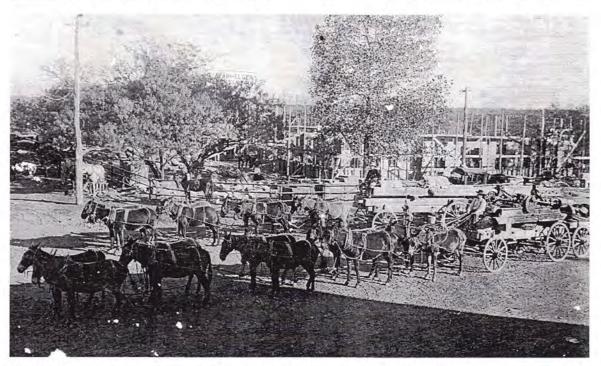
Construction began on the new courthouse in September of 1910. Work proceeded quickly. The new building was occupied less than one year later.
